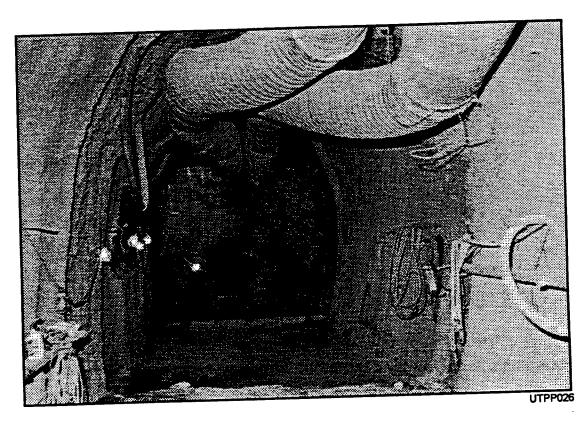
Finished Rear ( Lower ) Bulkhead from Inside Plug
